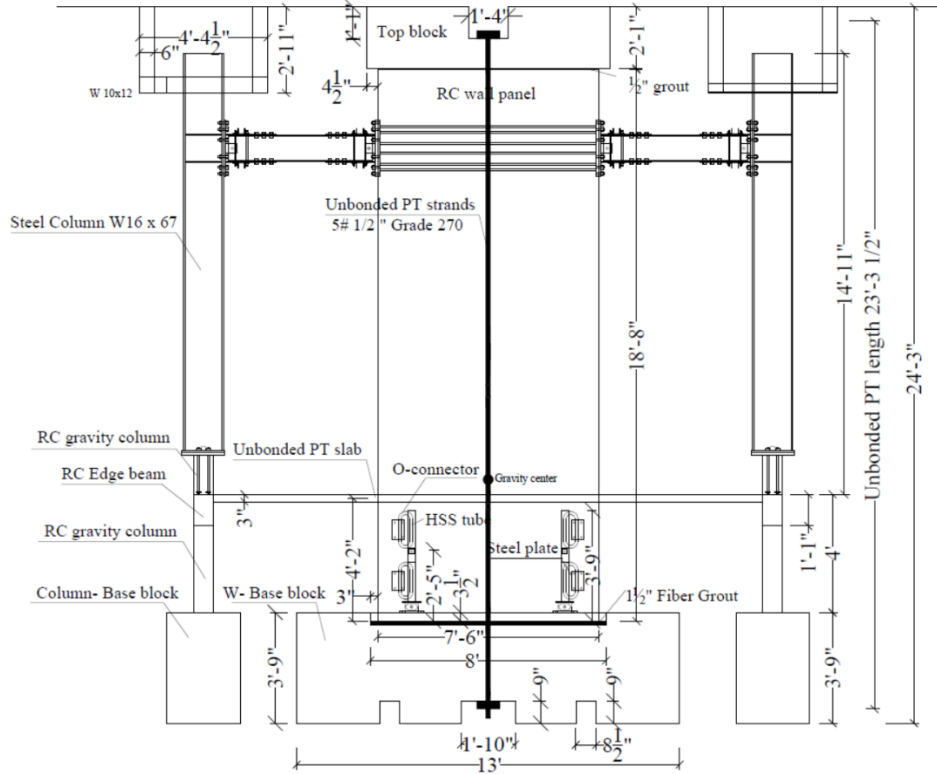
Elevation view of specimen PFS1 (Liu 2016)
